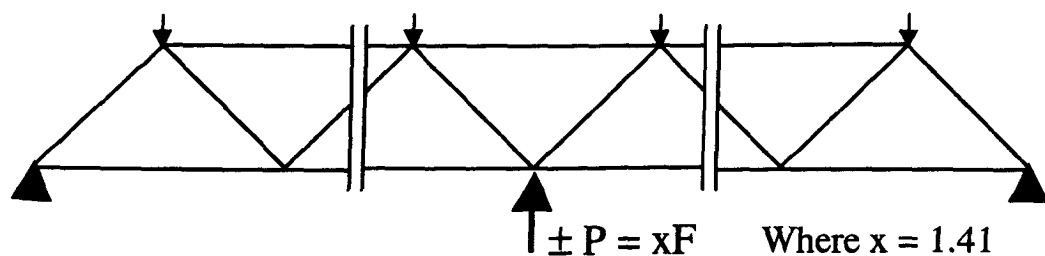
Example of a truss arrangement where the purlin load may be very high
